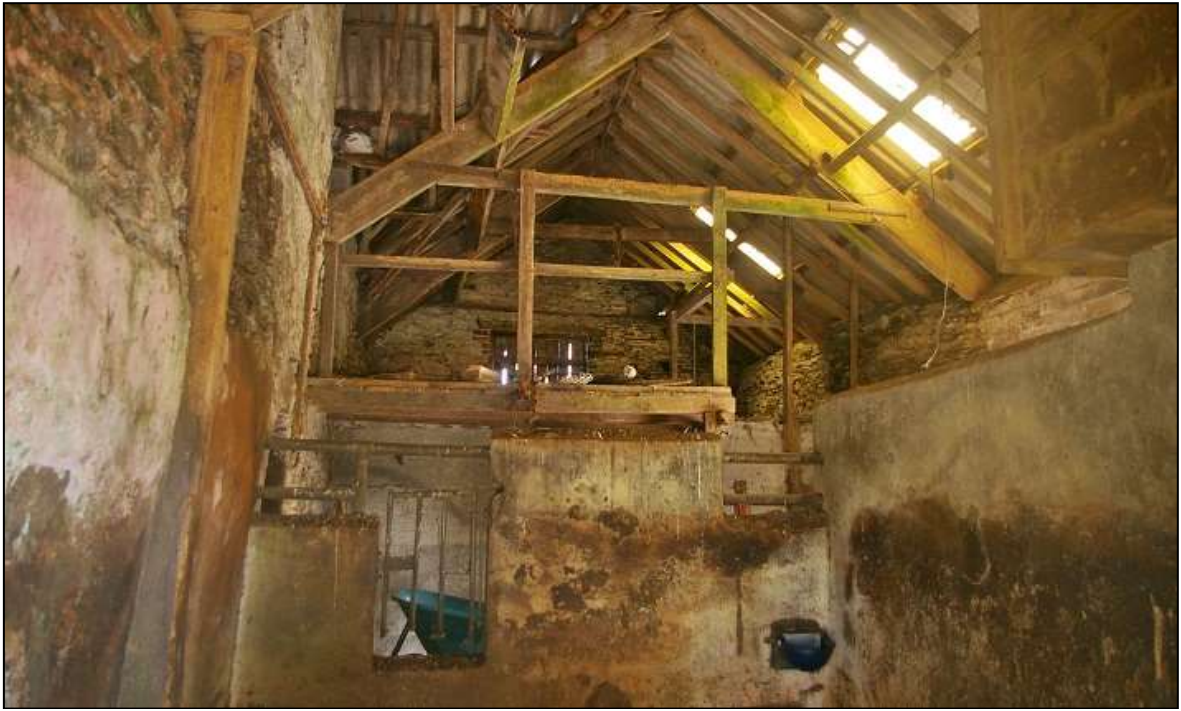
ROOM A; VIEWED FROM THE WEST.
